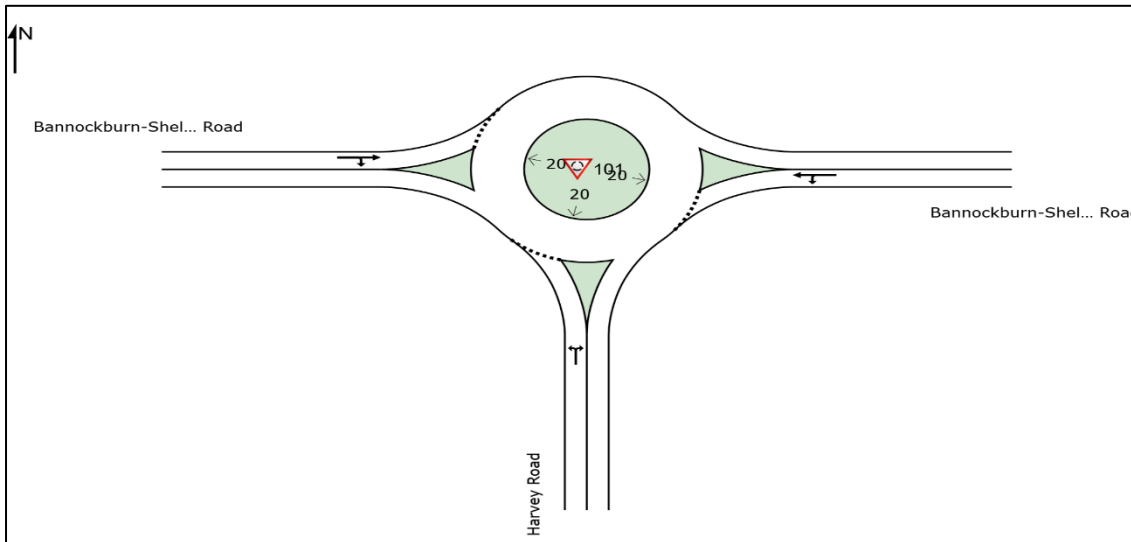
Harvey Road / Bannockburn-Shelford Road SIDRA interim intersection layout
